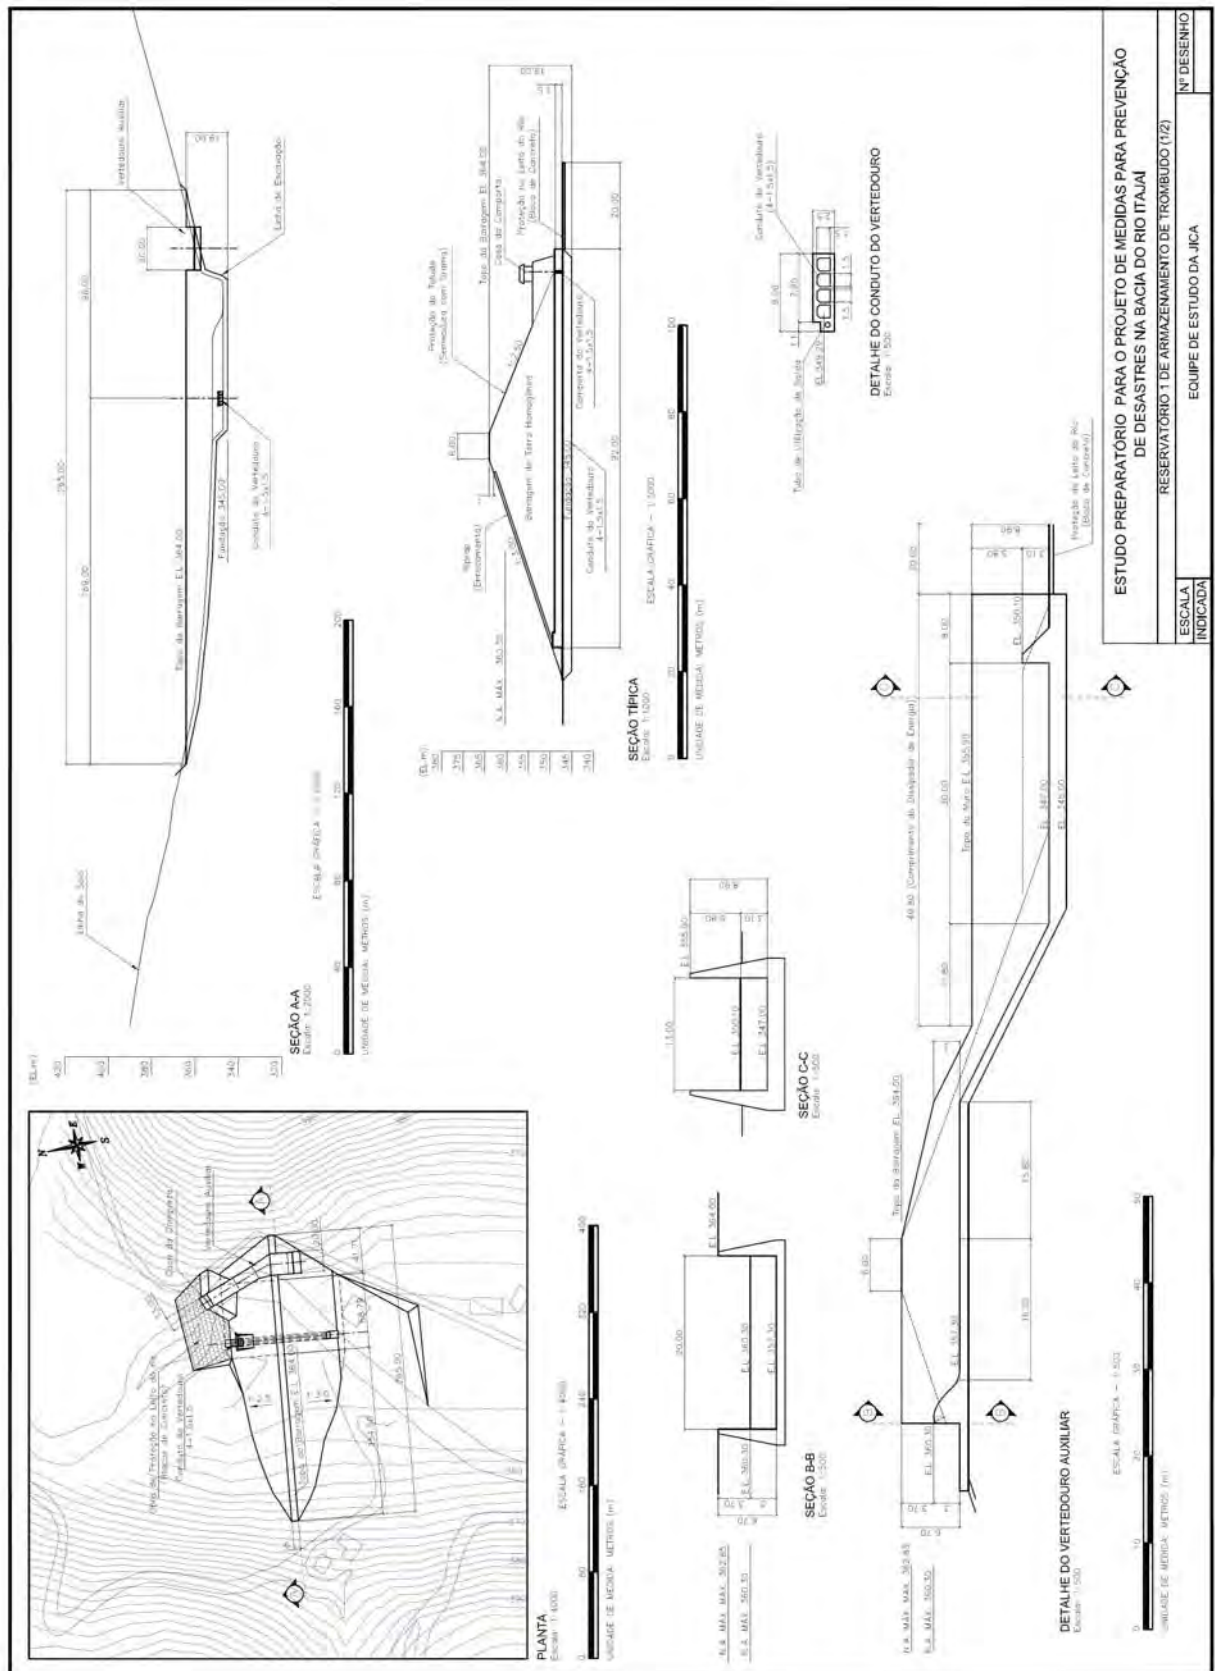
Structural Drawing of Small Dam (Site-1 on Trombudo River)
